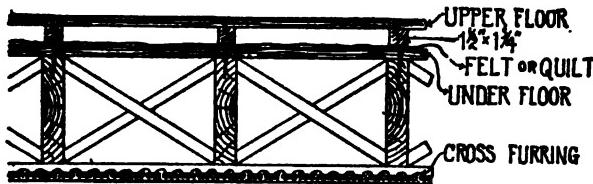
System of Deadening Where Over and Underfloors are Used.
